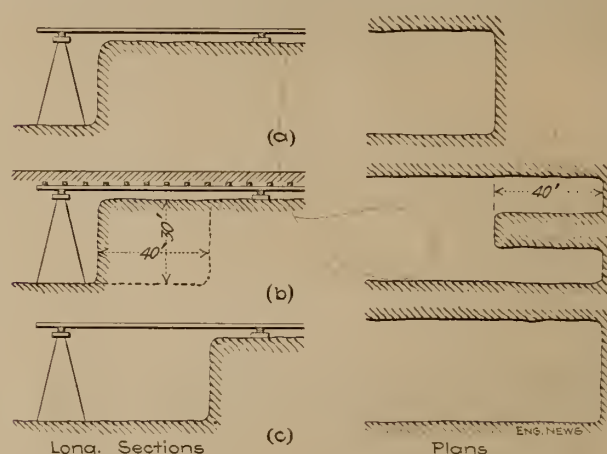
SKETCH ILLUSTRATING PROGRESS OF EXCAVATION IN DEEP ROCK TUNNEL ON SECTION 13, LEXINGTON AVE.
